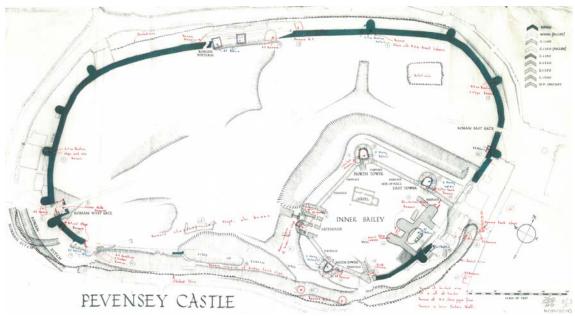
1940s plan showing some of the military defences being removed; at the east side (right) can be seen the missing section of Roman wall facing towards the village (NMR MP/PEV0043)
